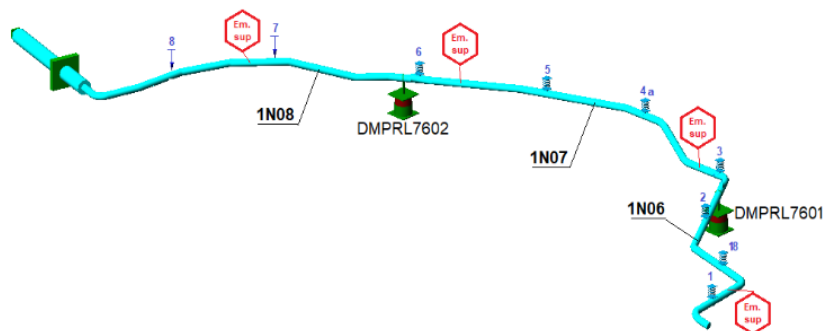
Layout of the feed-water RL76 piping in the containment LO2 with dampers location.
